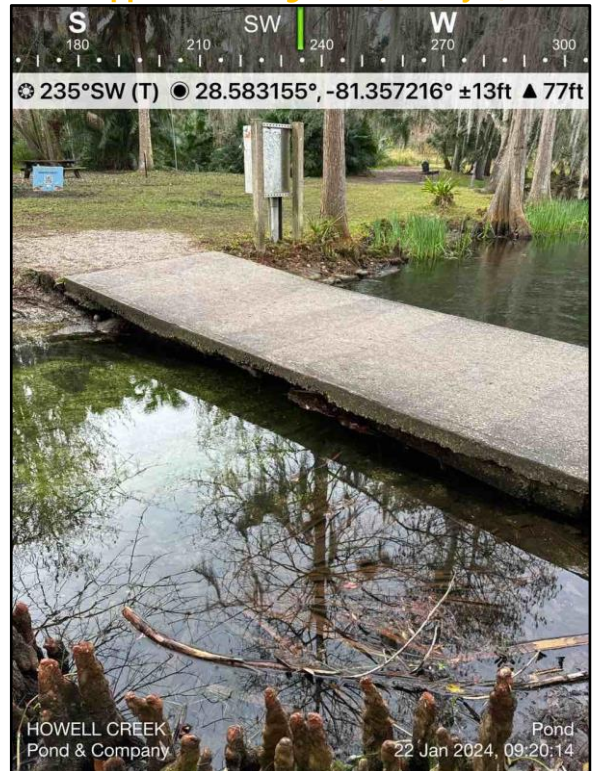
Structure 4; Sheet Pile Wooden Capped Retaining Wall (Priority 3)
